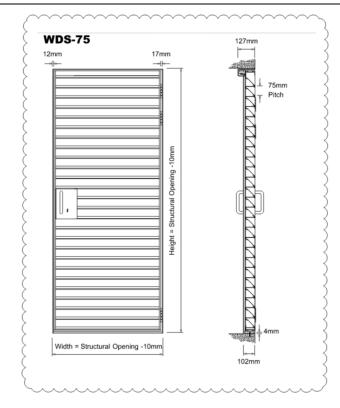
(as above): Proposed elevation and section of the lower ground floor vault louvre door
